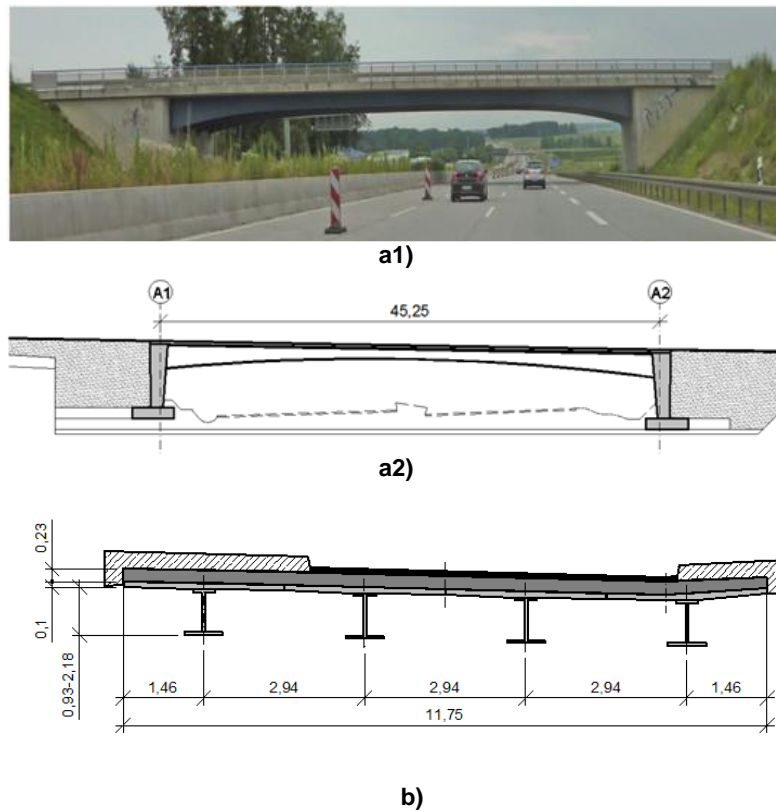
Case B1: Integral composite bridge: a1) and a2) Longitudinal view; b) Cross section with girders of variable height [3].
